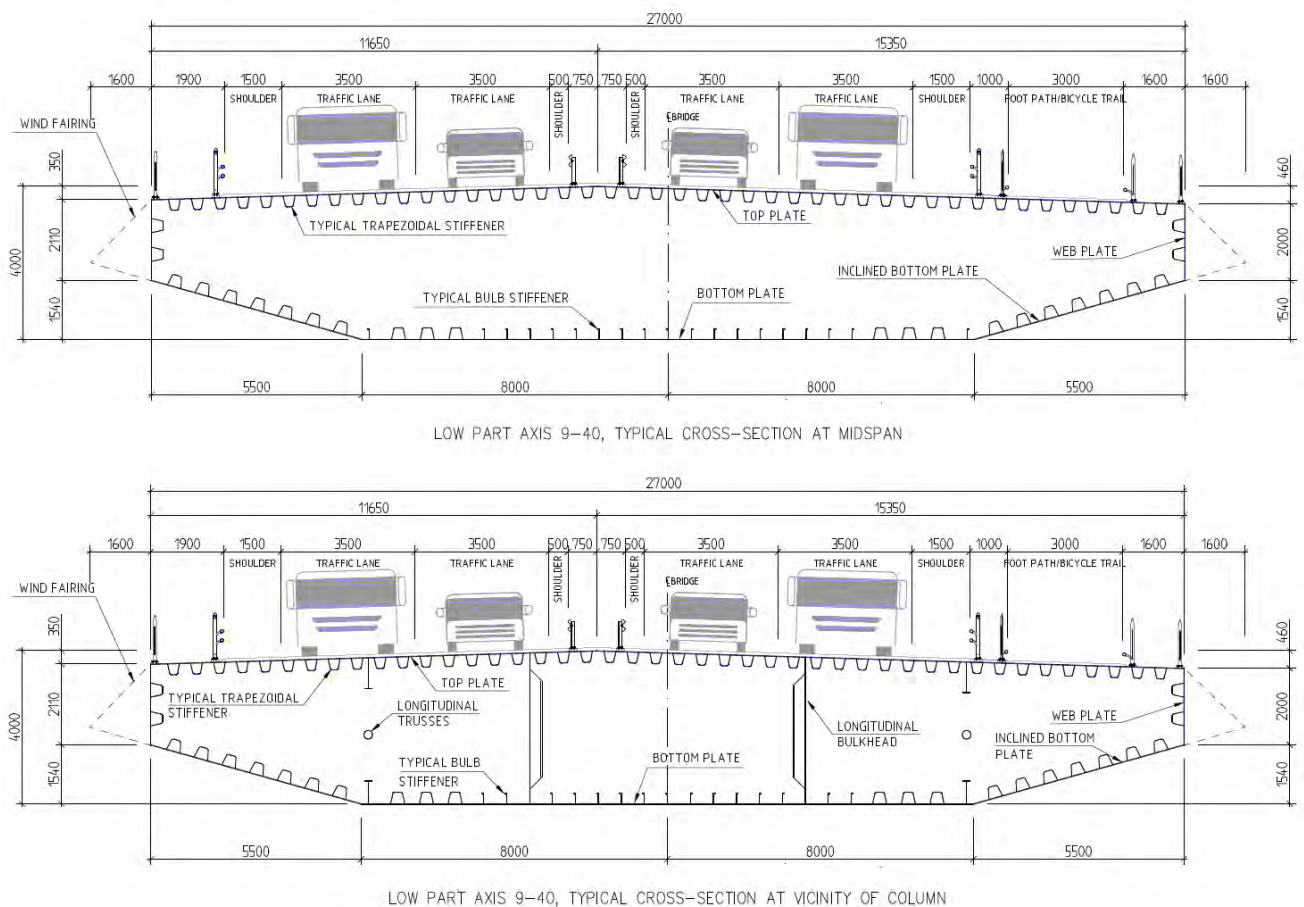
Cross section of bridge girder at midspan and in vicinity of the column
